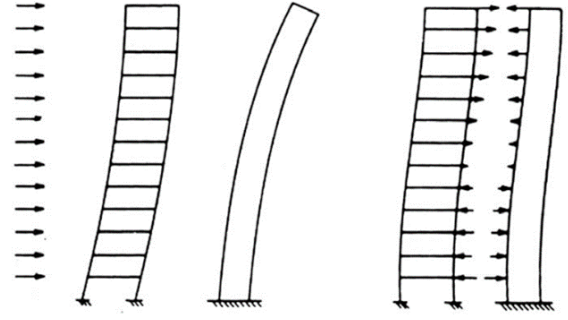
Deflected shape of (a) a frame structure, (b) a cantilevered wall, and (c) a wall-frame structure.
